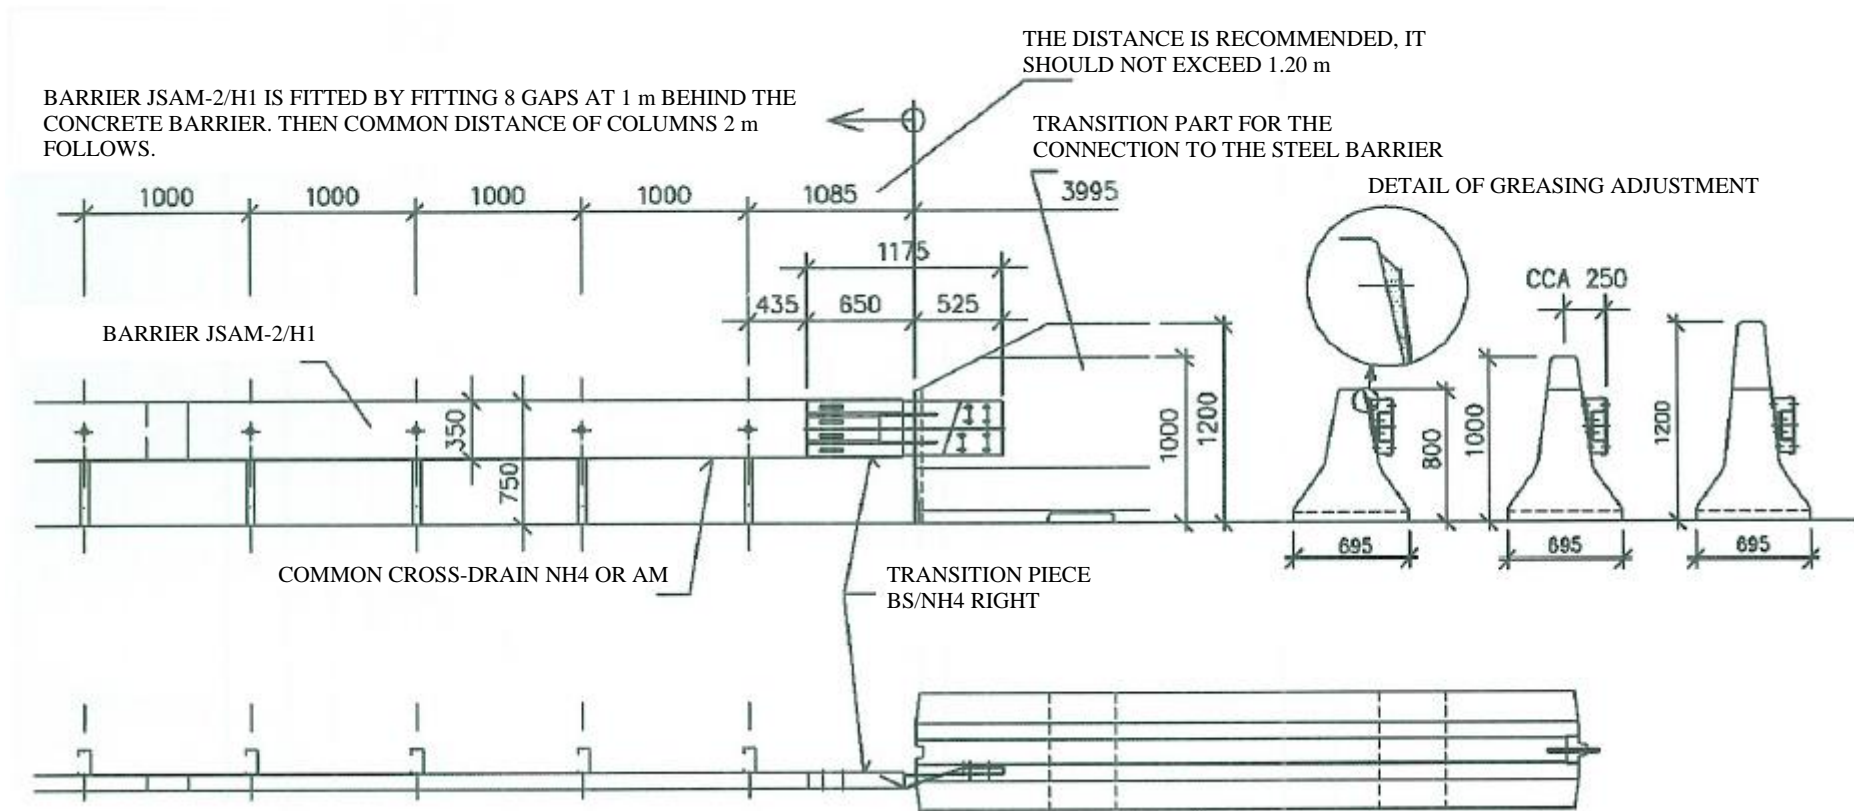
Connection example of steel cross-drain JSAM-2/H1
